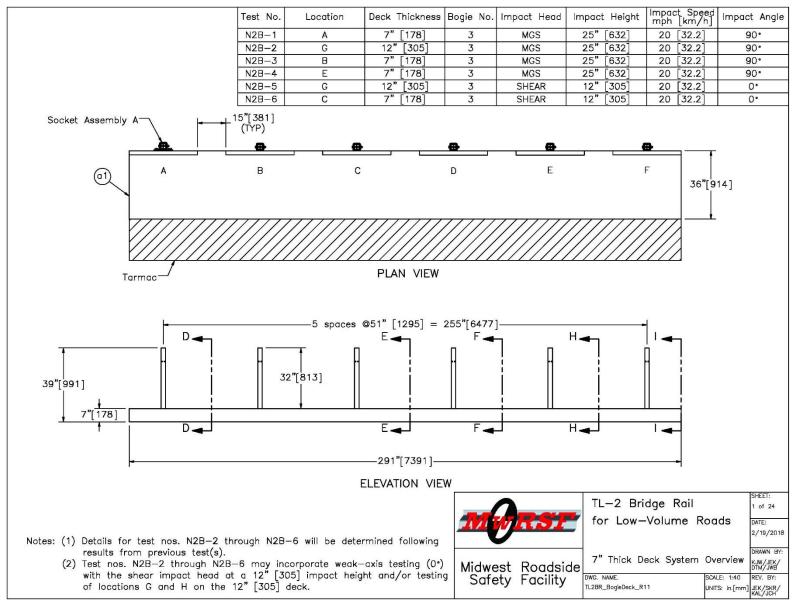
Bogie Testing Matrix and Setup, 7-in. Thick Deck System Overview
